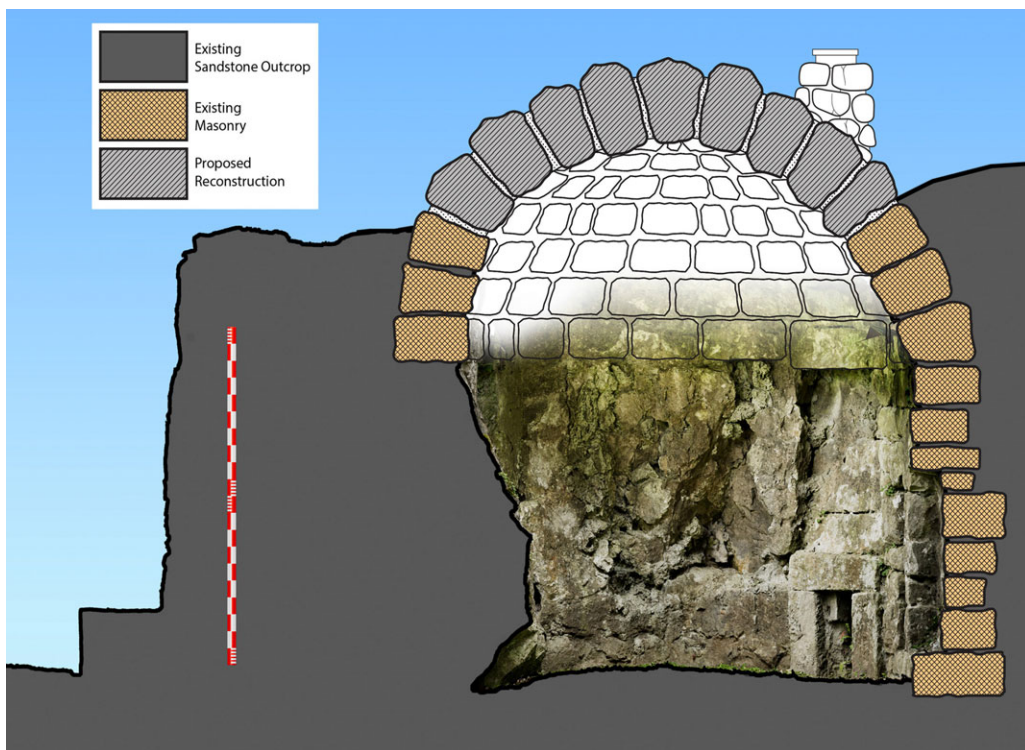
Reconstruction, c 1750–1837: section XX. *Image:* authors.
